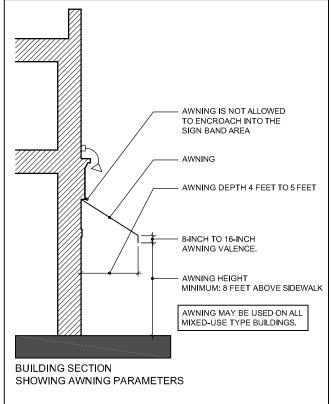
MIXED USE BUILDING TYPE AWNING
